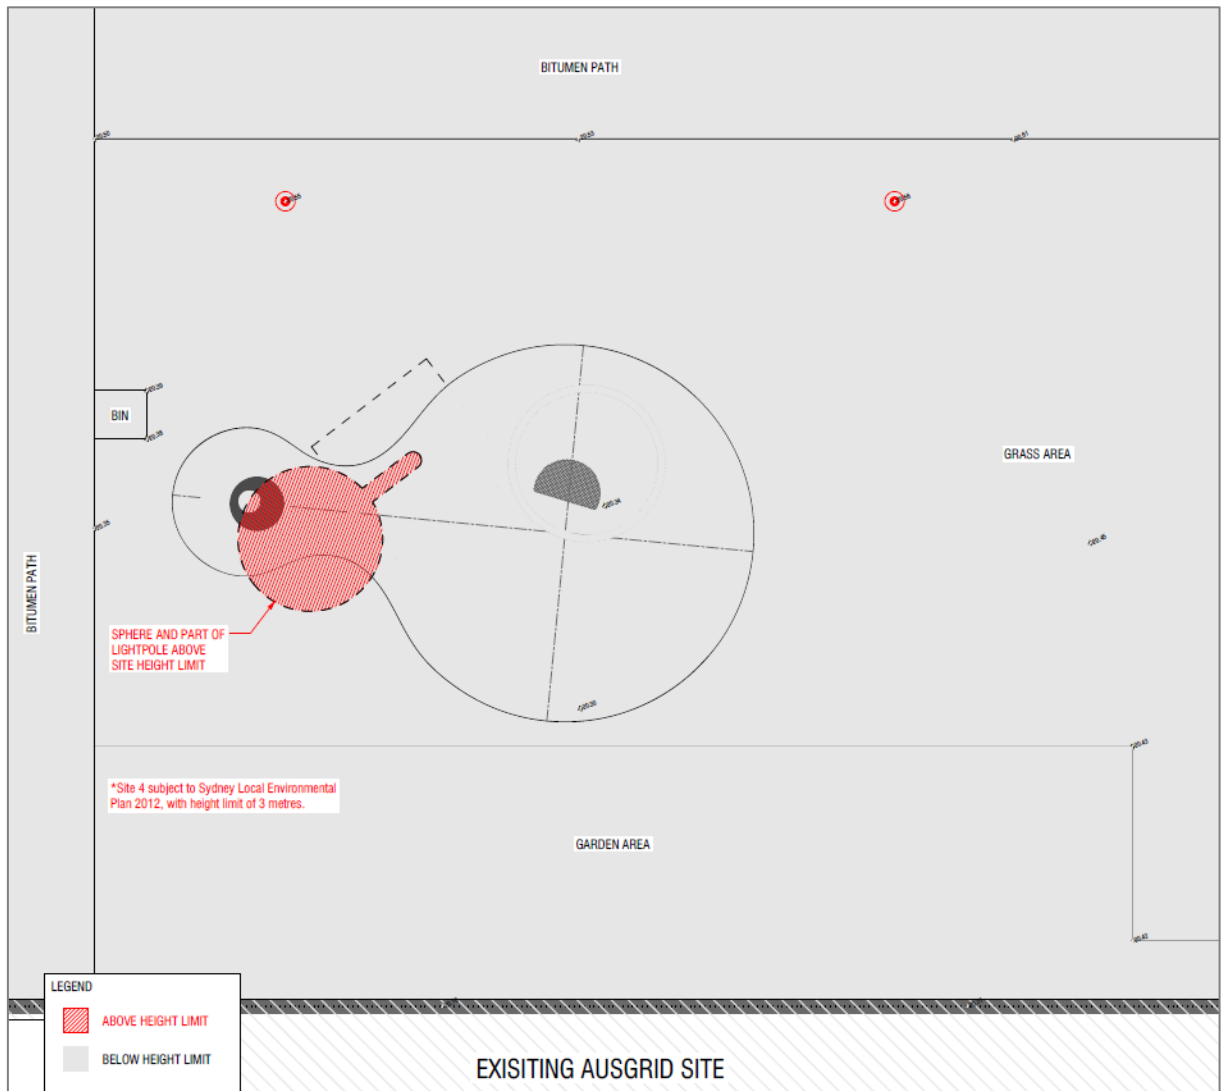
Extract of Height Plane Diagram, portions shaded red located above height limit (Source: Shop 1 Projects).
